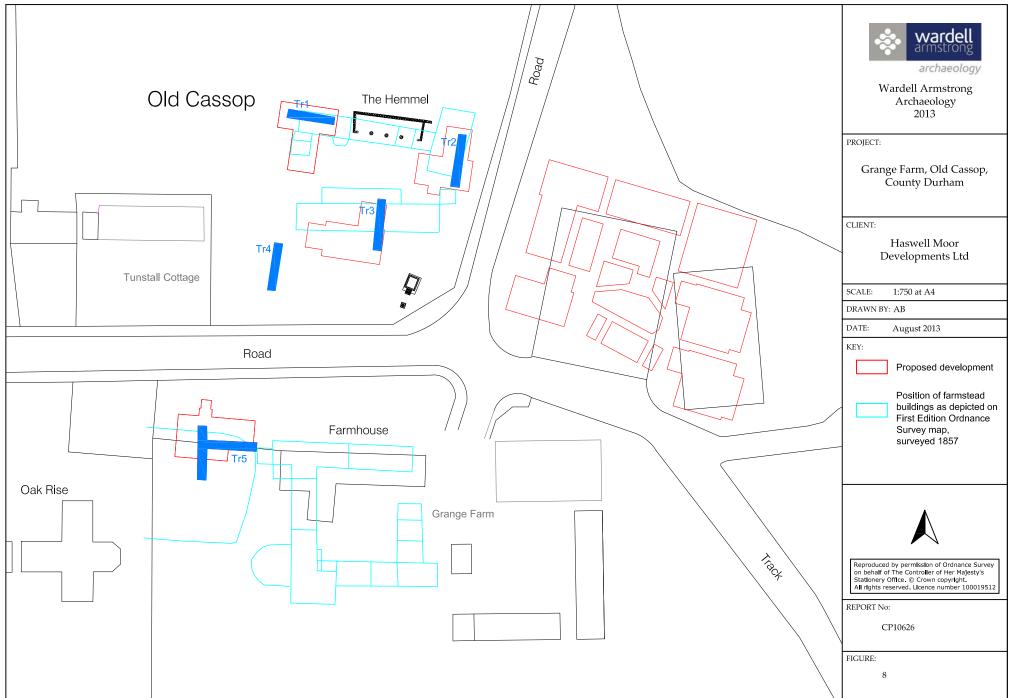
Site plan showing position of farmstead buildings surveyed in 1857.
